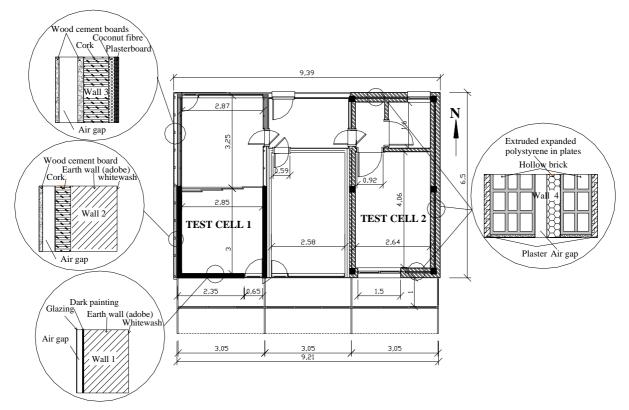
Schematic plan of the Test cells and schematic section of some envelope components (distances in metres)
